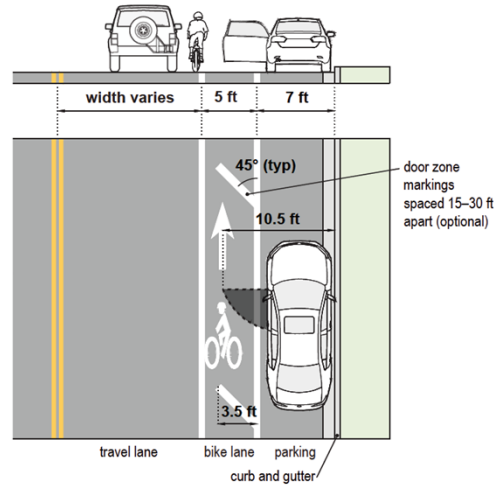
Constrained Bike Lane Adjacent to Parking Example
